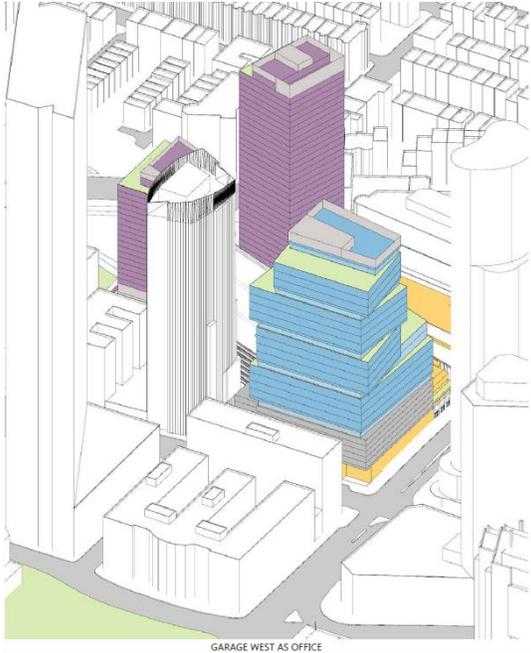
Preferred Alternative design of Garage West building used in Wind Tunnel Testing on April, 2016
